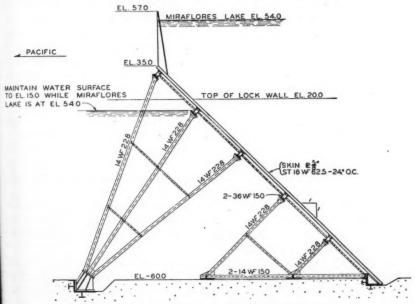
Cross Section, Temporary Steel Dam in Tidal Lock
